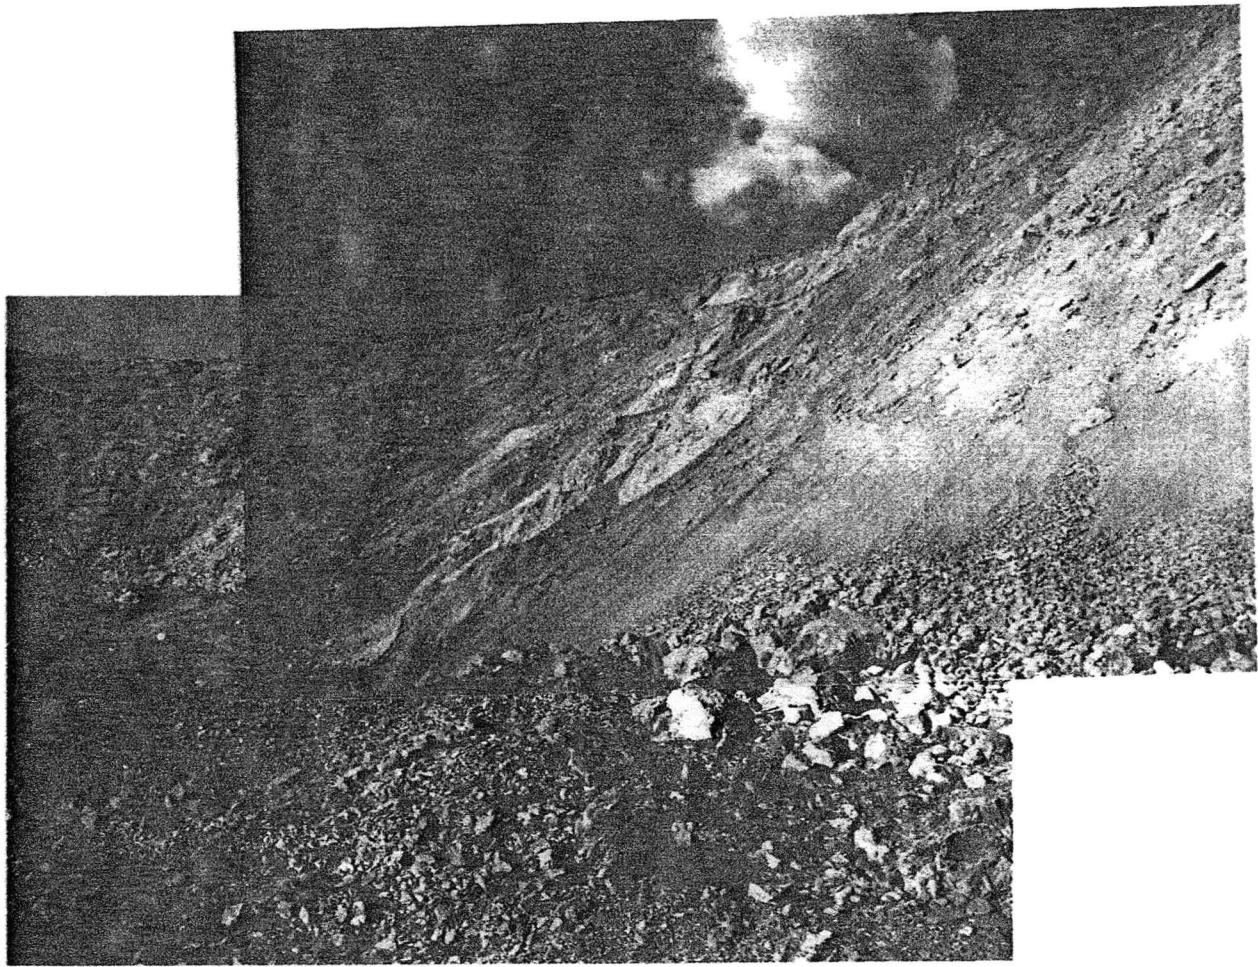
Lower area of the south slump. To protect against ravel, push up an 8 foot high pile with 1 1/2:1 side slopes along the toe of the talus. Mining excavation can then commence outside the berm.
